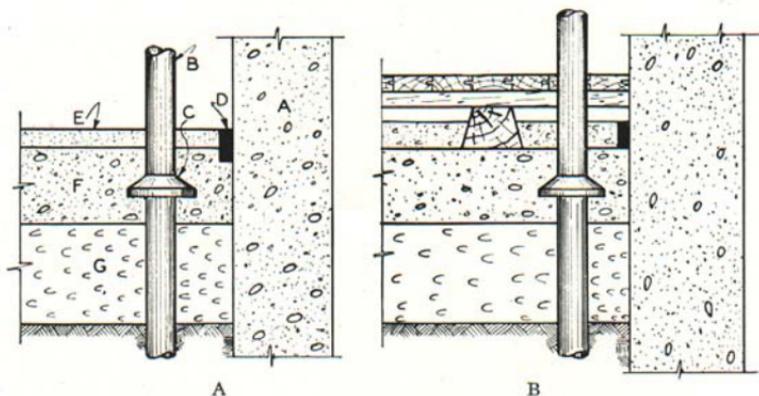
Showing two types of construction. Ordinary type of construction, in which the floor is sealed to the foundation wall by means of a channel containing an asphalt mastic expansion joint, showing the proper way to break the possible ascent of termites by a metal flange around the pipe. a, foundation wall; b, pipe; c, flange of corrosion-resistant metal; d, asphalt mastic expansion joint; e, high grade cement; f, ordinary concrete; g, gravel and concrete.
